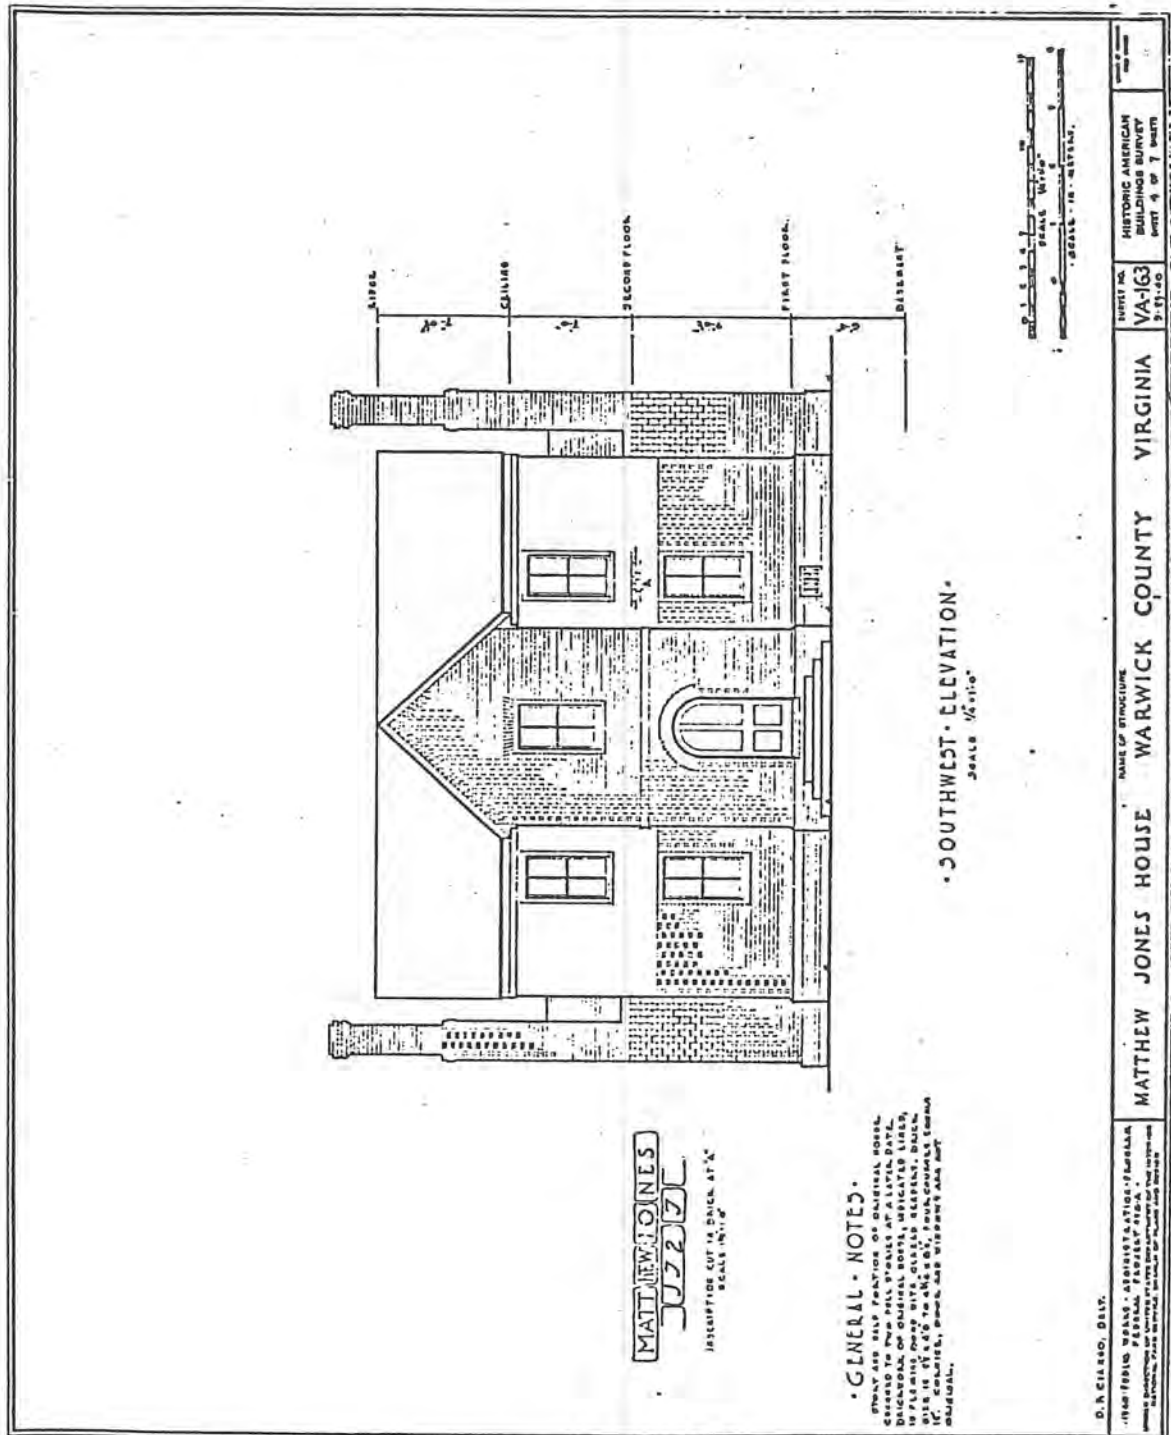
Matthew Jones House, HABS drawing (1940), southwest elevation.
